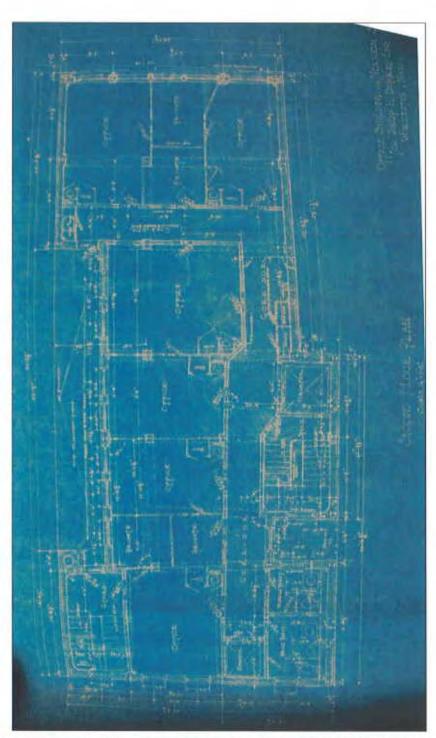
1924 Duprey Building, second floor plan. Reproduced by permission from the Massachusetts State Archives.
